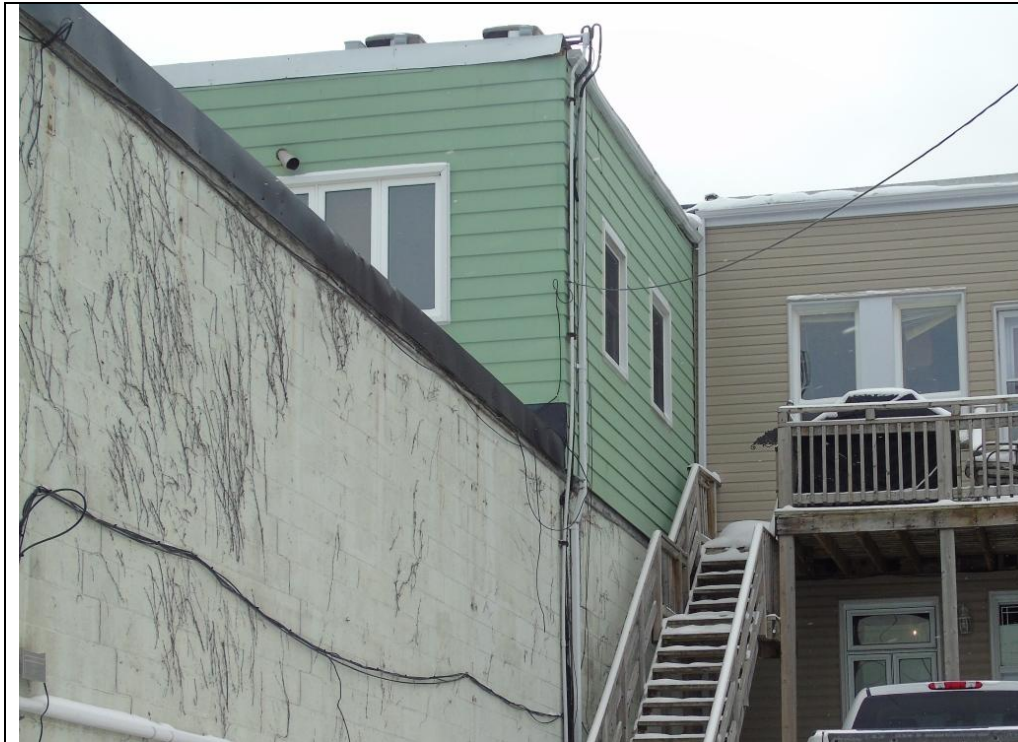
East elevation of the second floor of the modern rear addition at 69 Main Street South, looking southwest.
